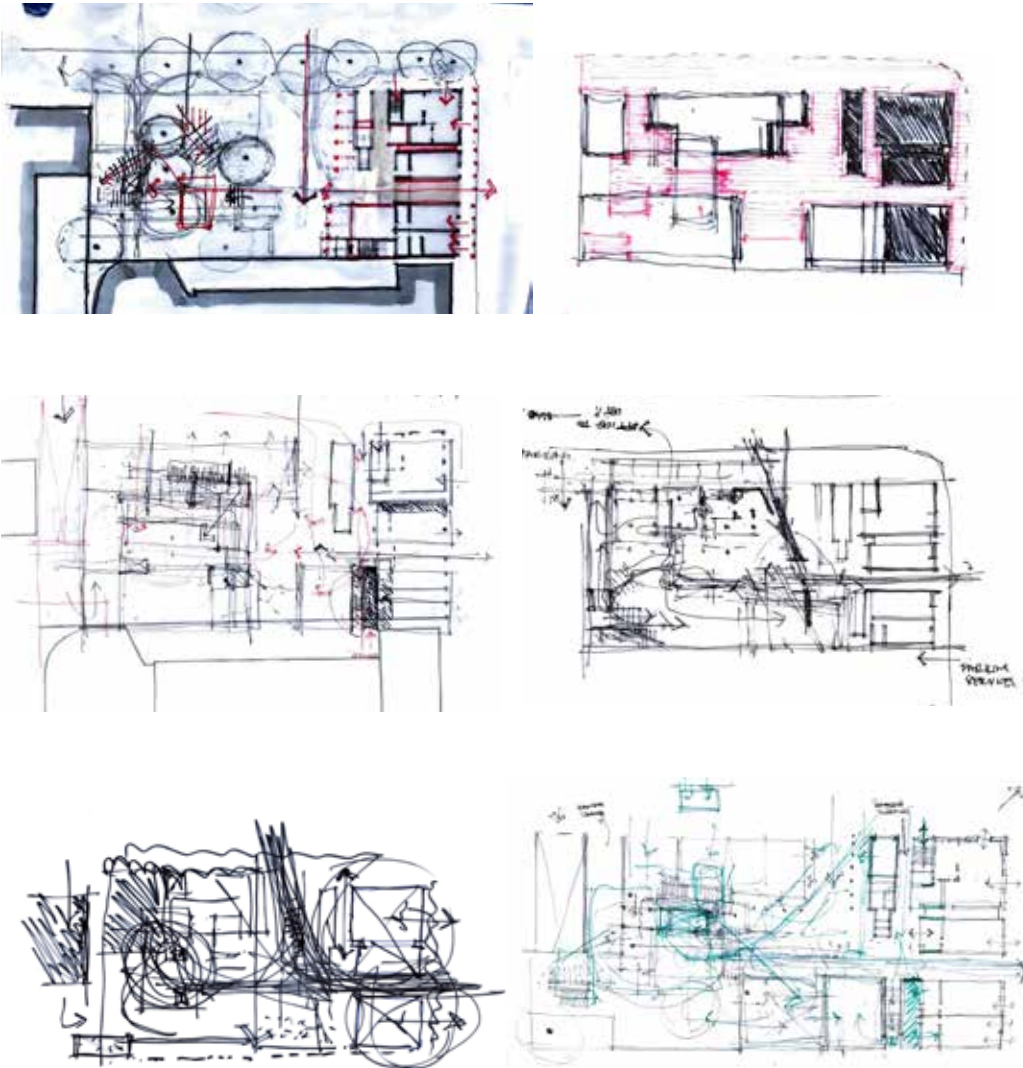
(this page) Ground floor plan explorations (Author, 2022)
